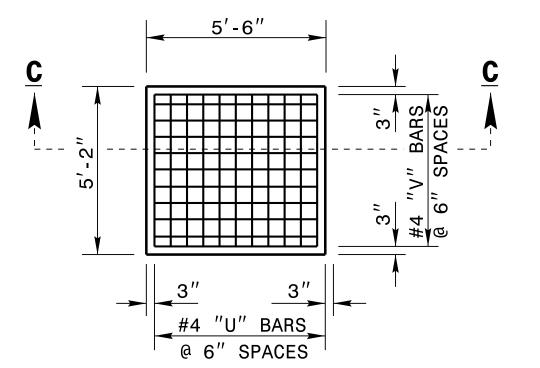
DETAIL SHOWING METHOD OF RISER CONSTRUCTION
